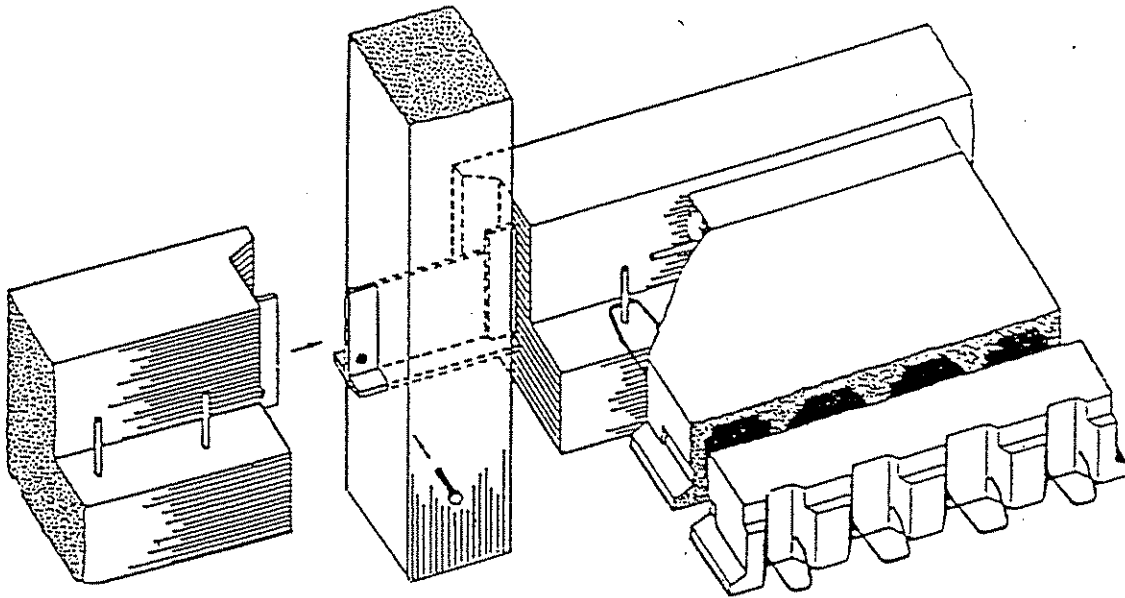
Column-to-edge beam connection detail. The steel plate from the column is bolted to the steel beam plate for stability during erection [adapted from Bison Concrete 1970].
